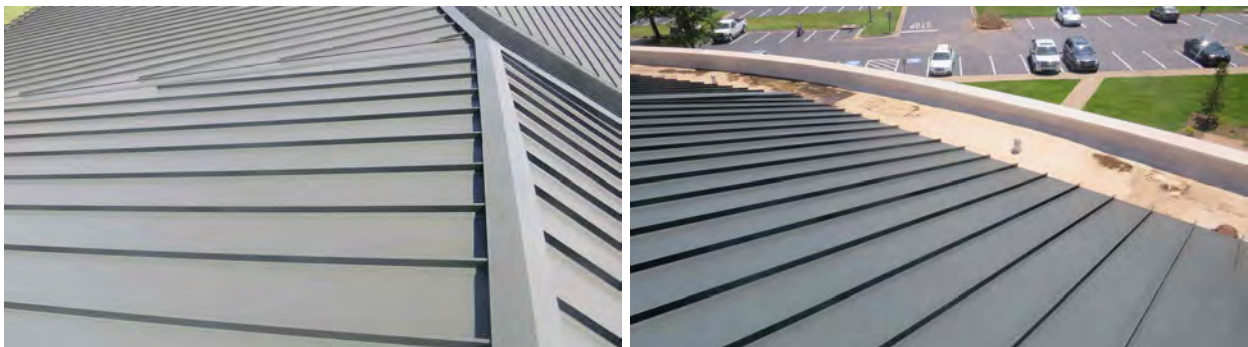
Roofing on the parking structure (9) with no wind damage.
